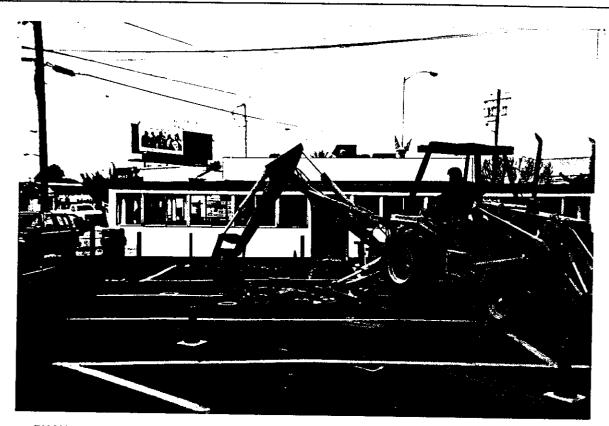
Duffy Diner's parking lot. Breaking asphalt of UST location.
